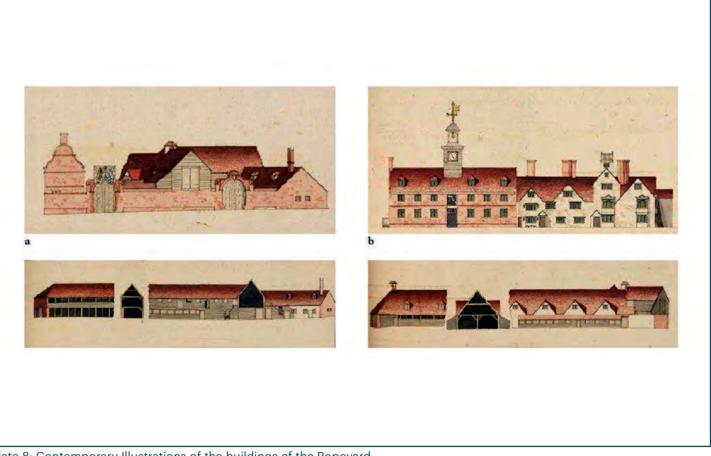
Contemporary Illustrations of the buildings of the Ropeyard
